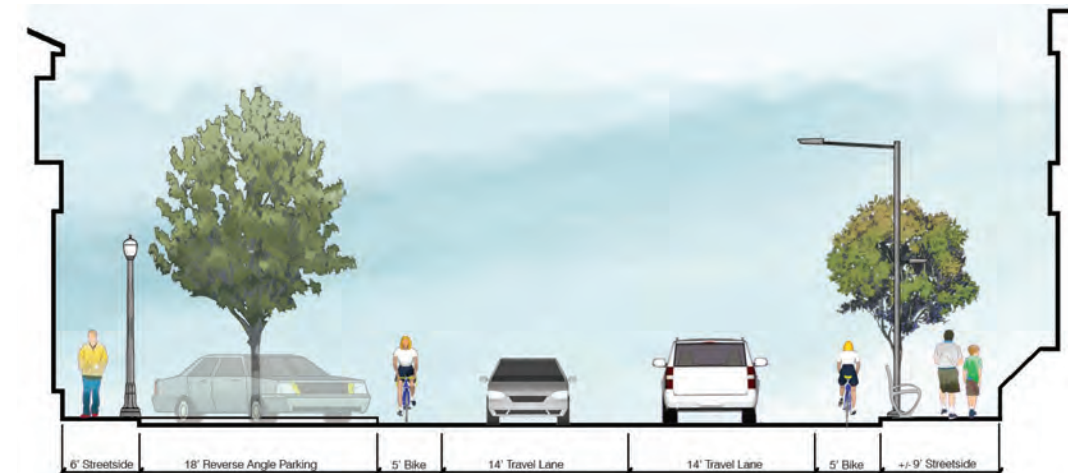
Jones Proposed Cross Section – Broadway to Avenue B
